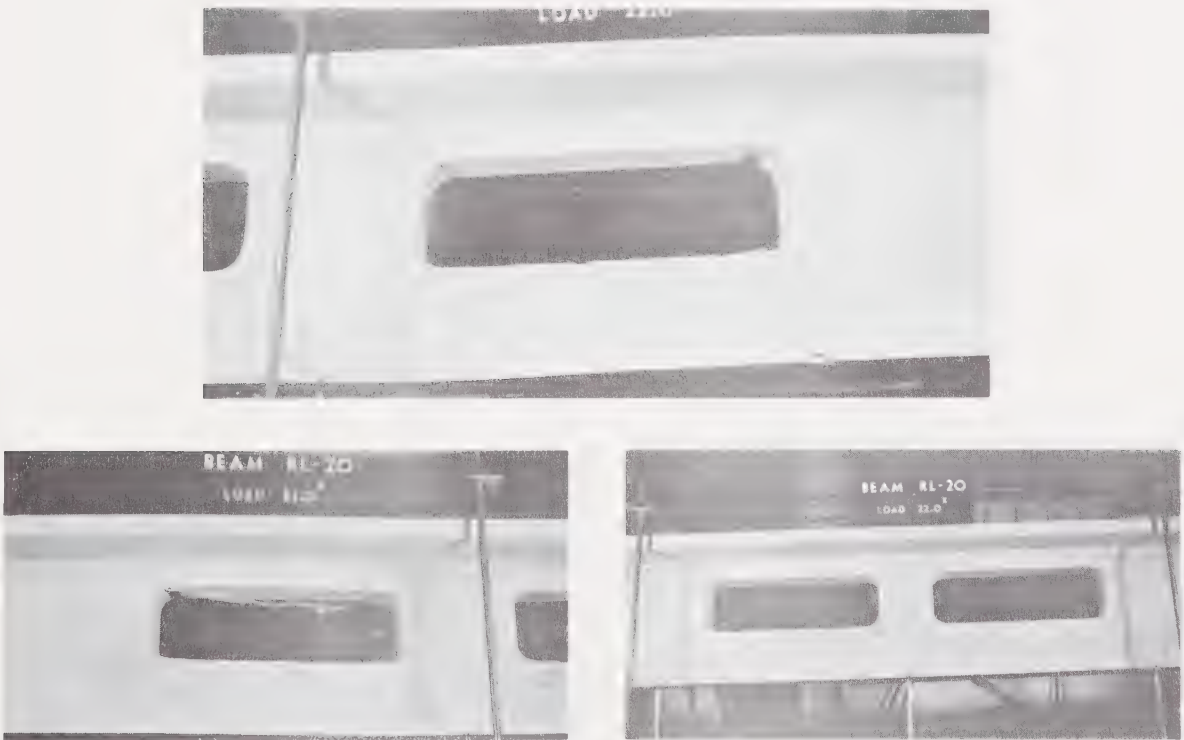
CRACKING AND FAILURE PATTERN OF BEAM 20-26-5
